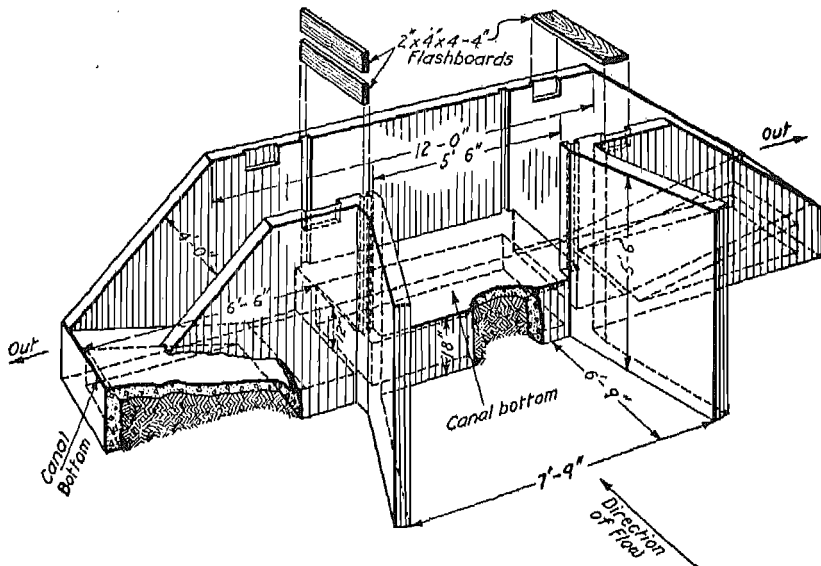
Concrete division box. (U.S.D.A. Farmers' Bul. 1243.)
